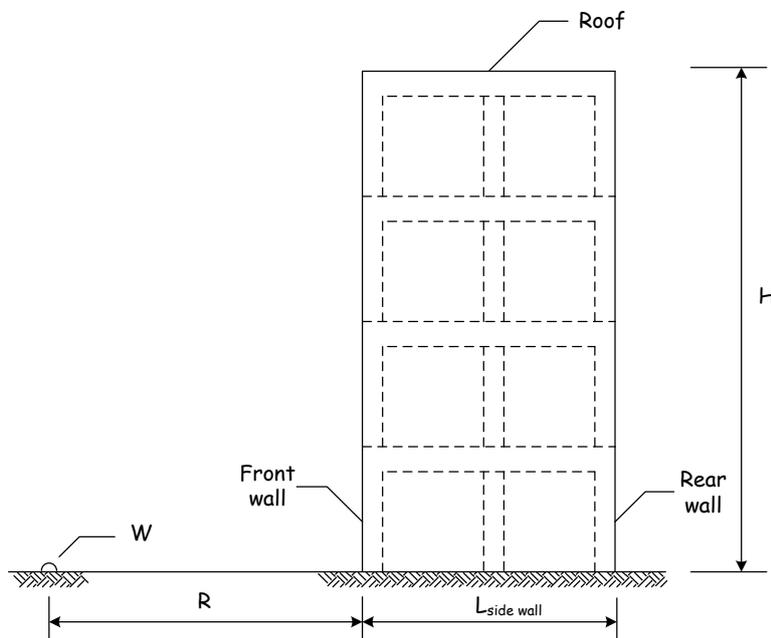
Model Structure Subjected to Blast Action (elevation)
